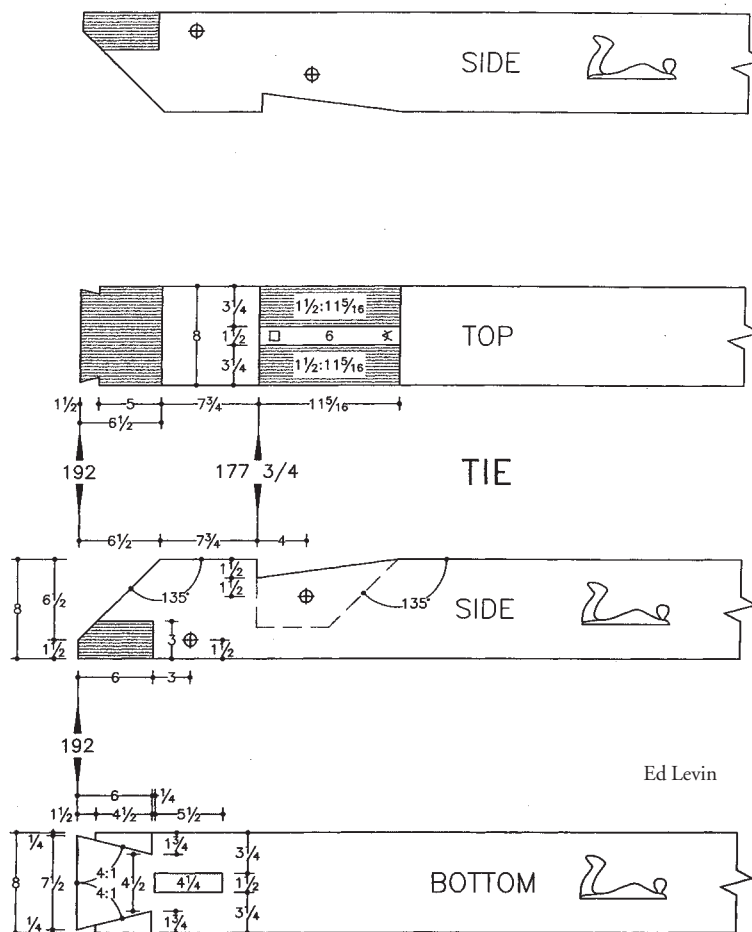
DETAIL OF FULLY SPECIFIED STICK DRAWING FOR SPECIALIZED JOINERY DESIGN.
